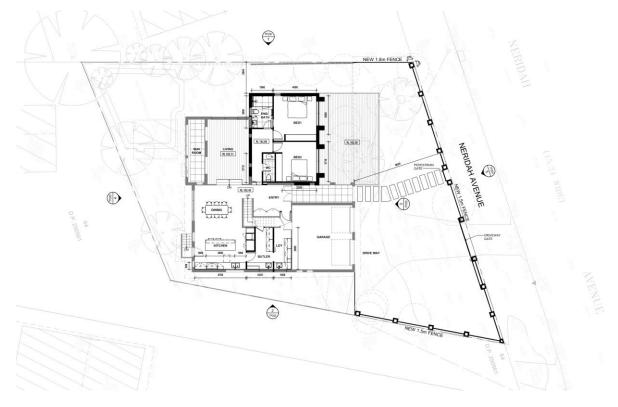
Proposed Ground Floor Plan (Source: Pixel Architecture Pty Ltd)
